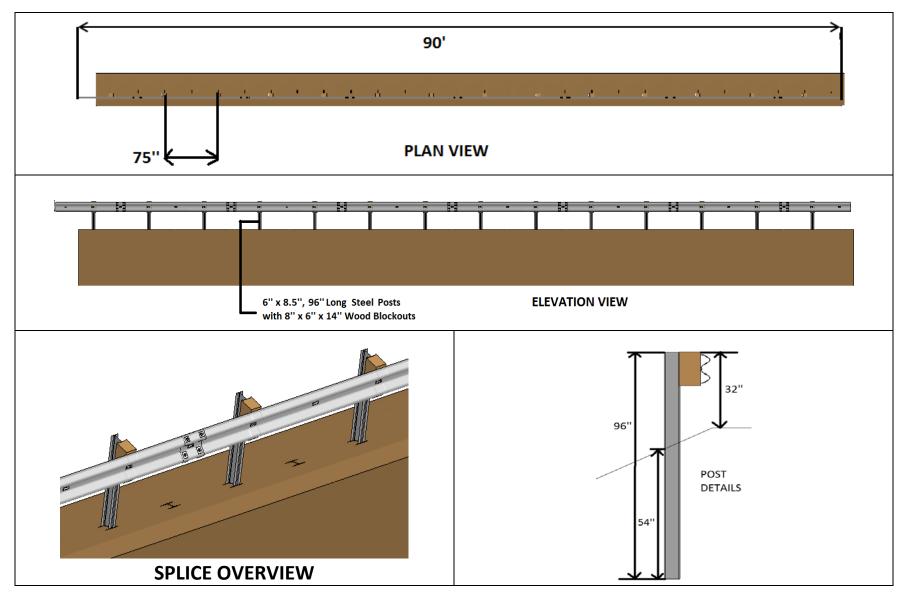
Details of the W-Beam Guardrail on 3H:1V Slope (2-ft).
